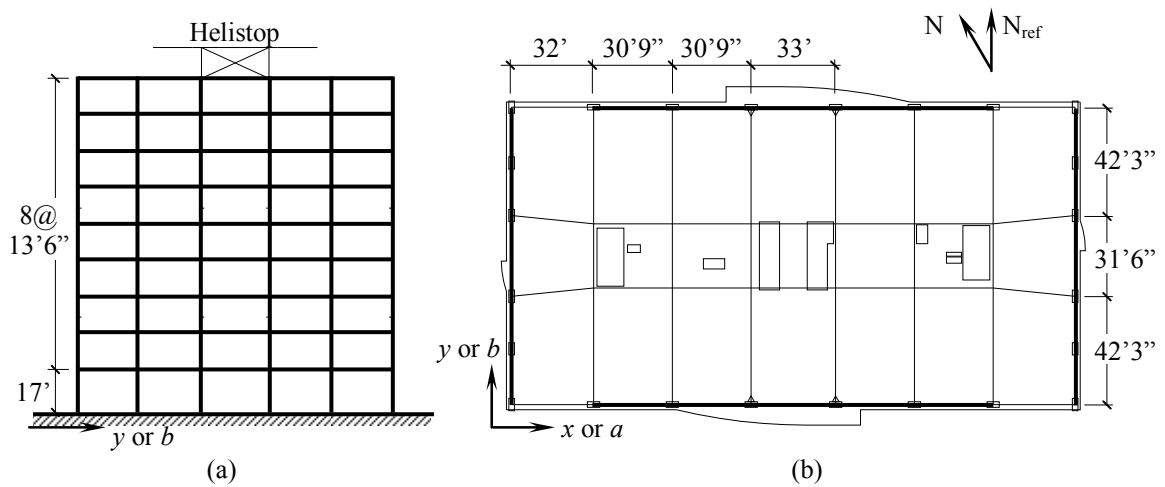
(a) West elevation; (b) typical floor plan of the selected 9-story symmetric-plan building.
